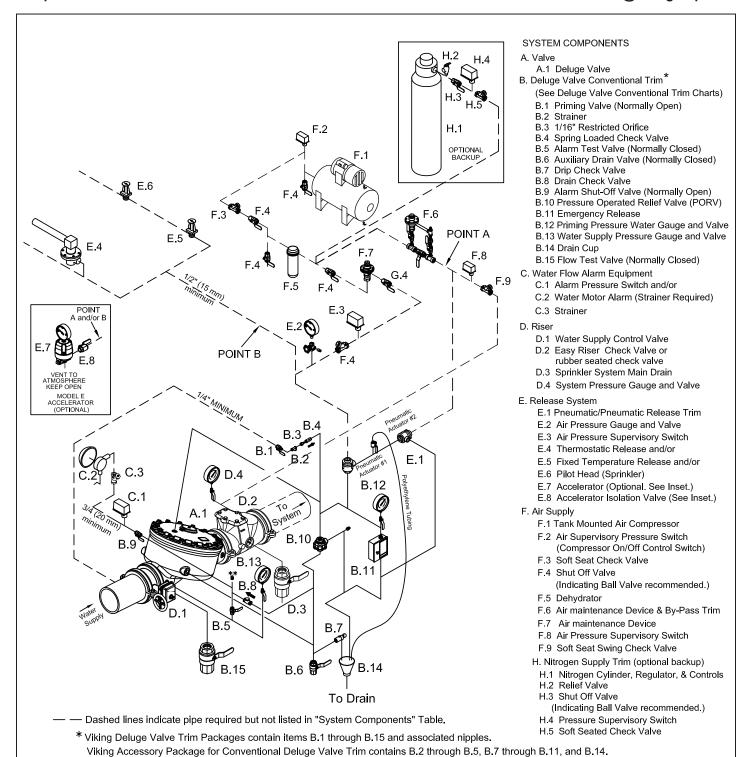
Straight Through Horizontal Valve with Tank-Mounted Compressor (6" Valve Shown)
